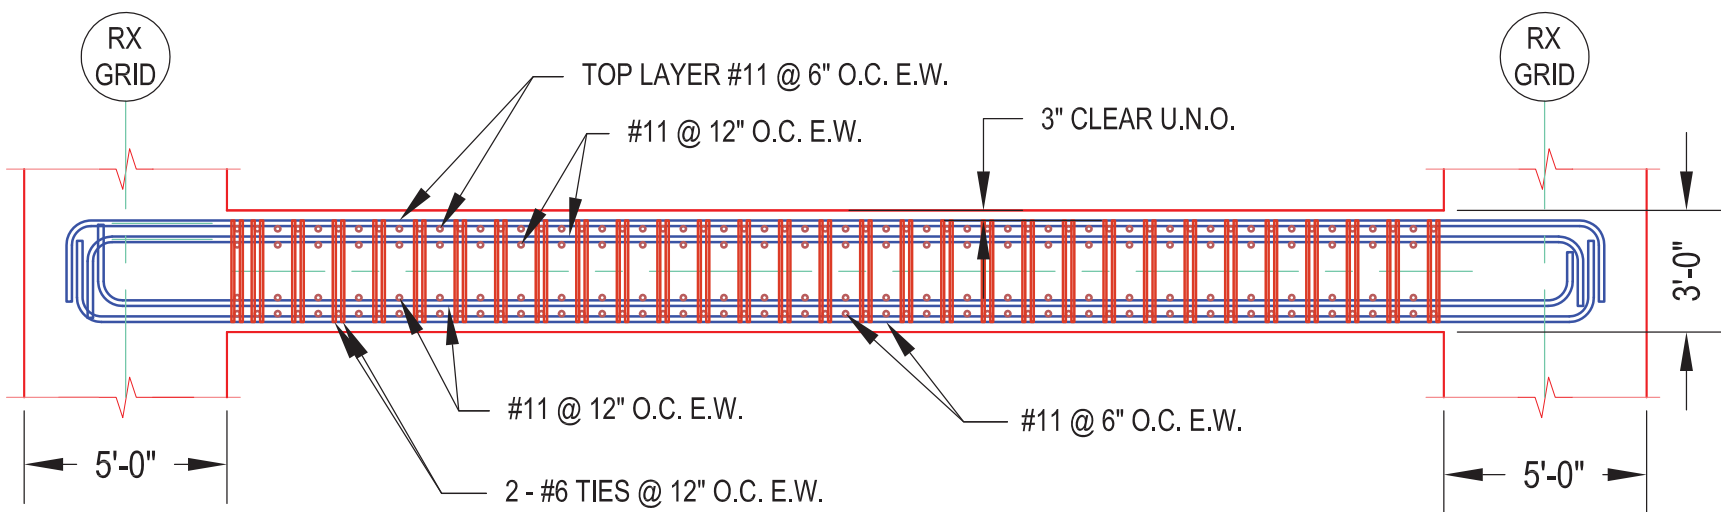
B-27: RXB Reinforcement Section View of Slab at EL 100'-0"
